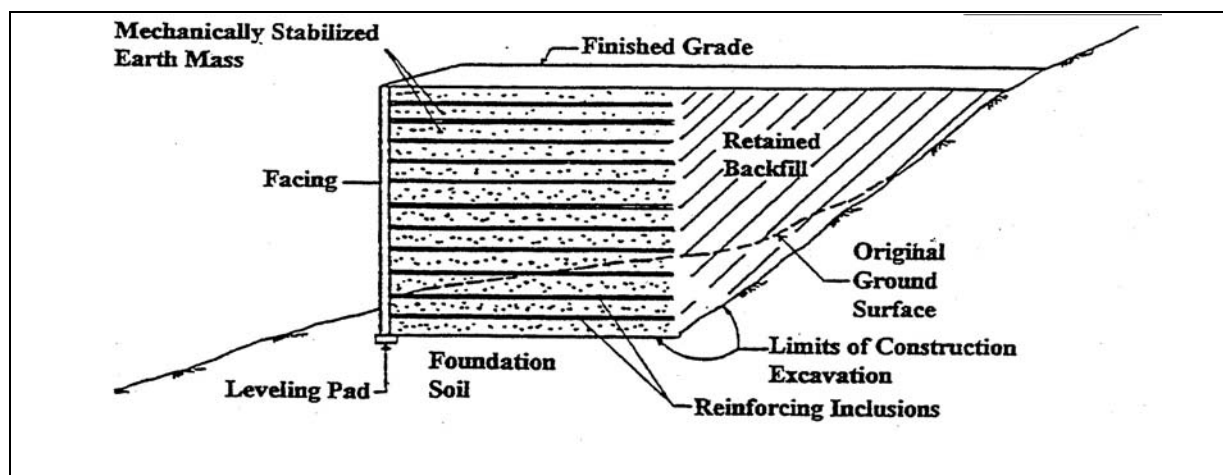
Mechanically Stabilized Earth Wall System (Figure 6-1, NHI Course 13236)
